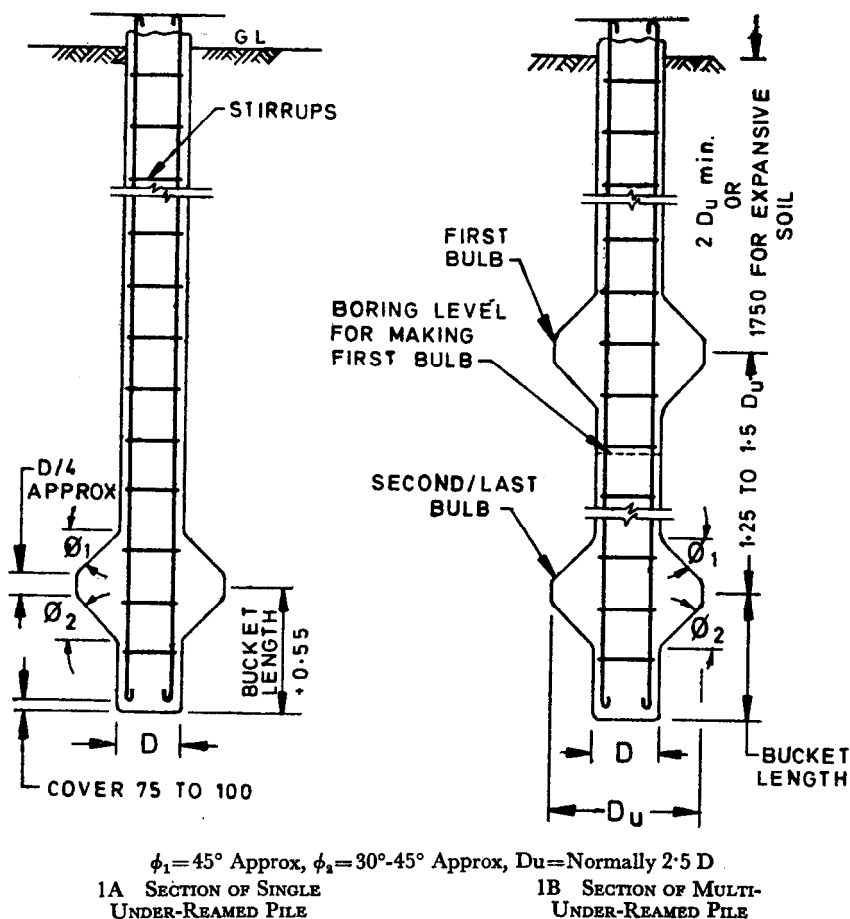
TYPICAL DETAILS OF BORED CAST *in situ* UNDER-REAMED PILE FOUNDATIONS
